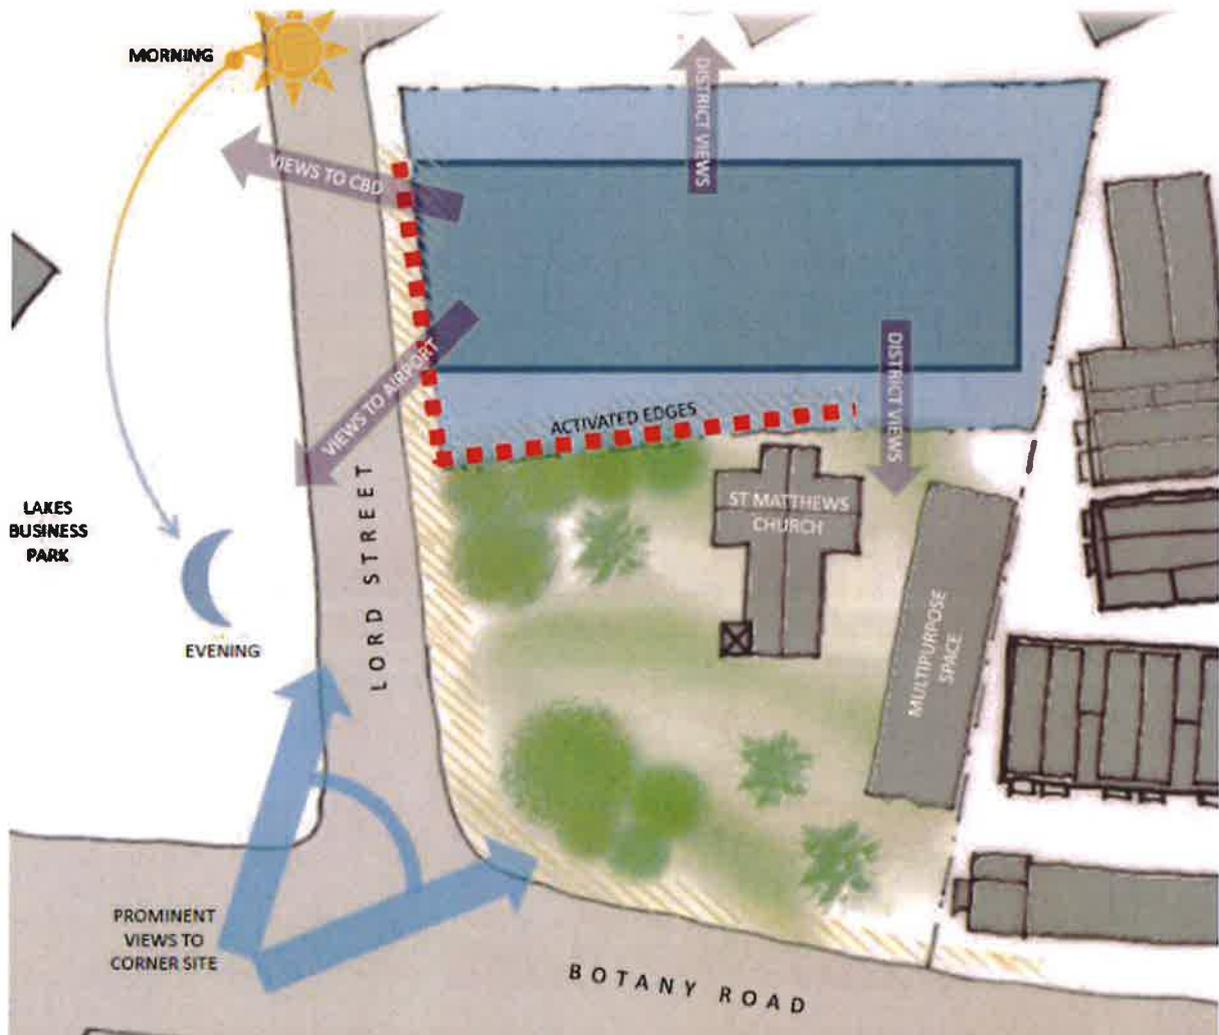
Context plan (Source: Planning Proposal & BuiltConsult Pty Ltd)
